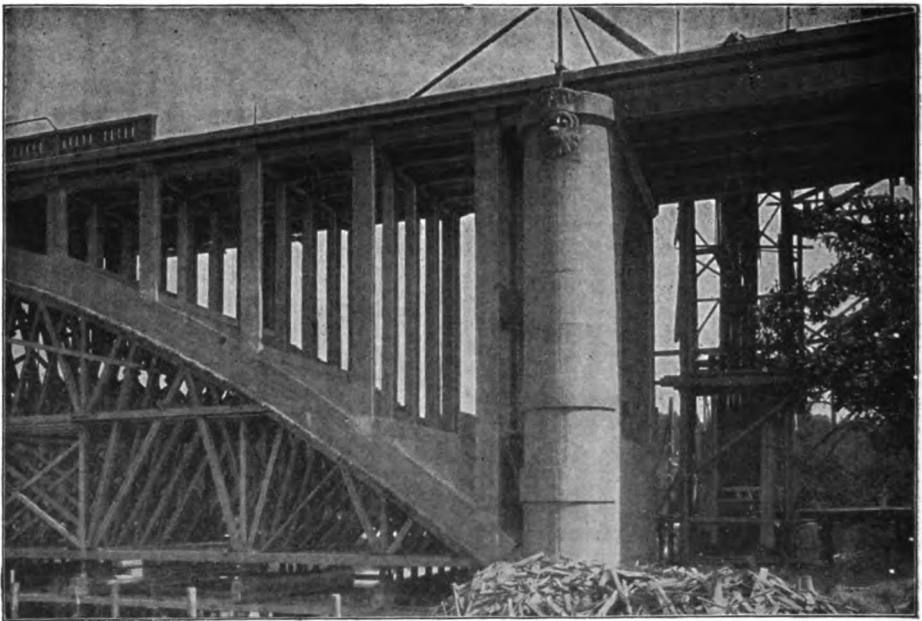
Highway bridge over the Isar near Grünwald. View of the left abutment.
